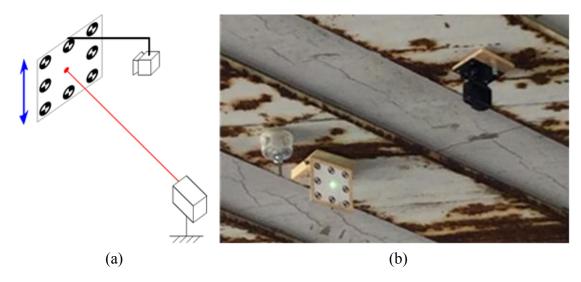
Schema of the system tracking (a) and photo of the system installed under a bridge deck (b)
